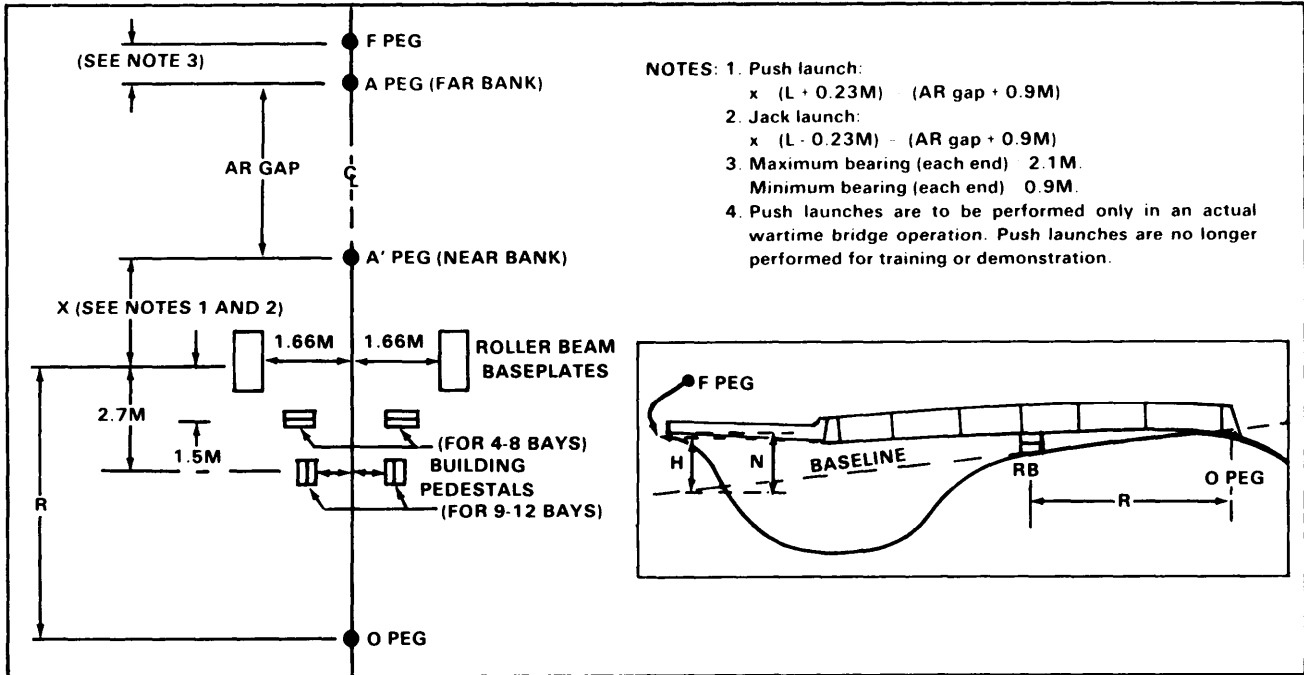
Single story MGB site layout (4 through 12 bays)
